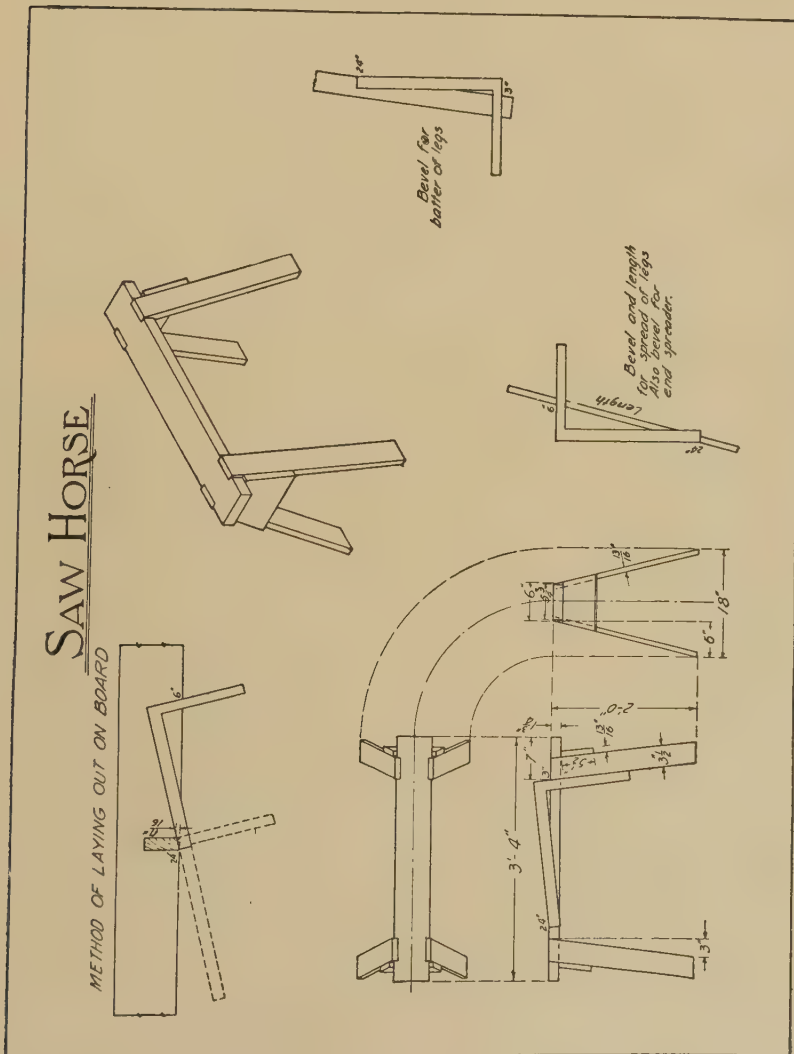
SAWHORSE SHOWING LAYOUT WITH FRAMING SQUARE
